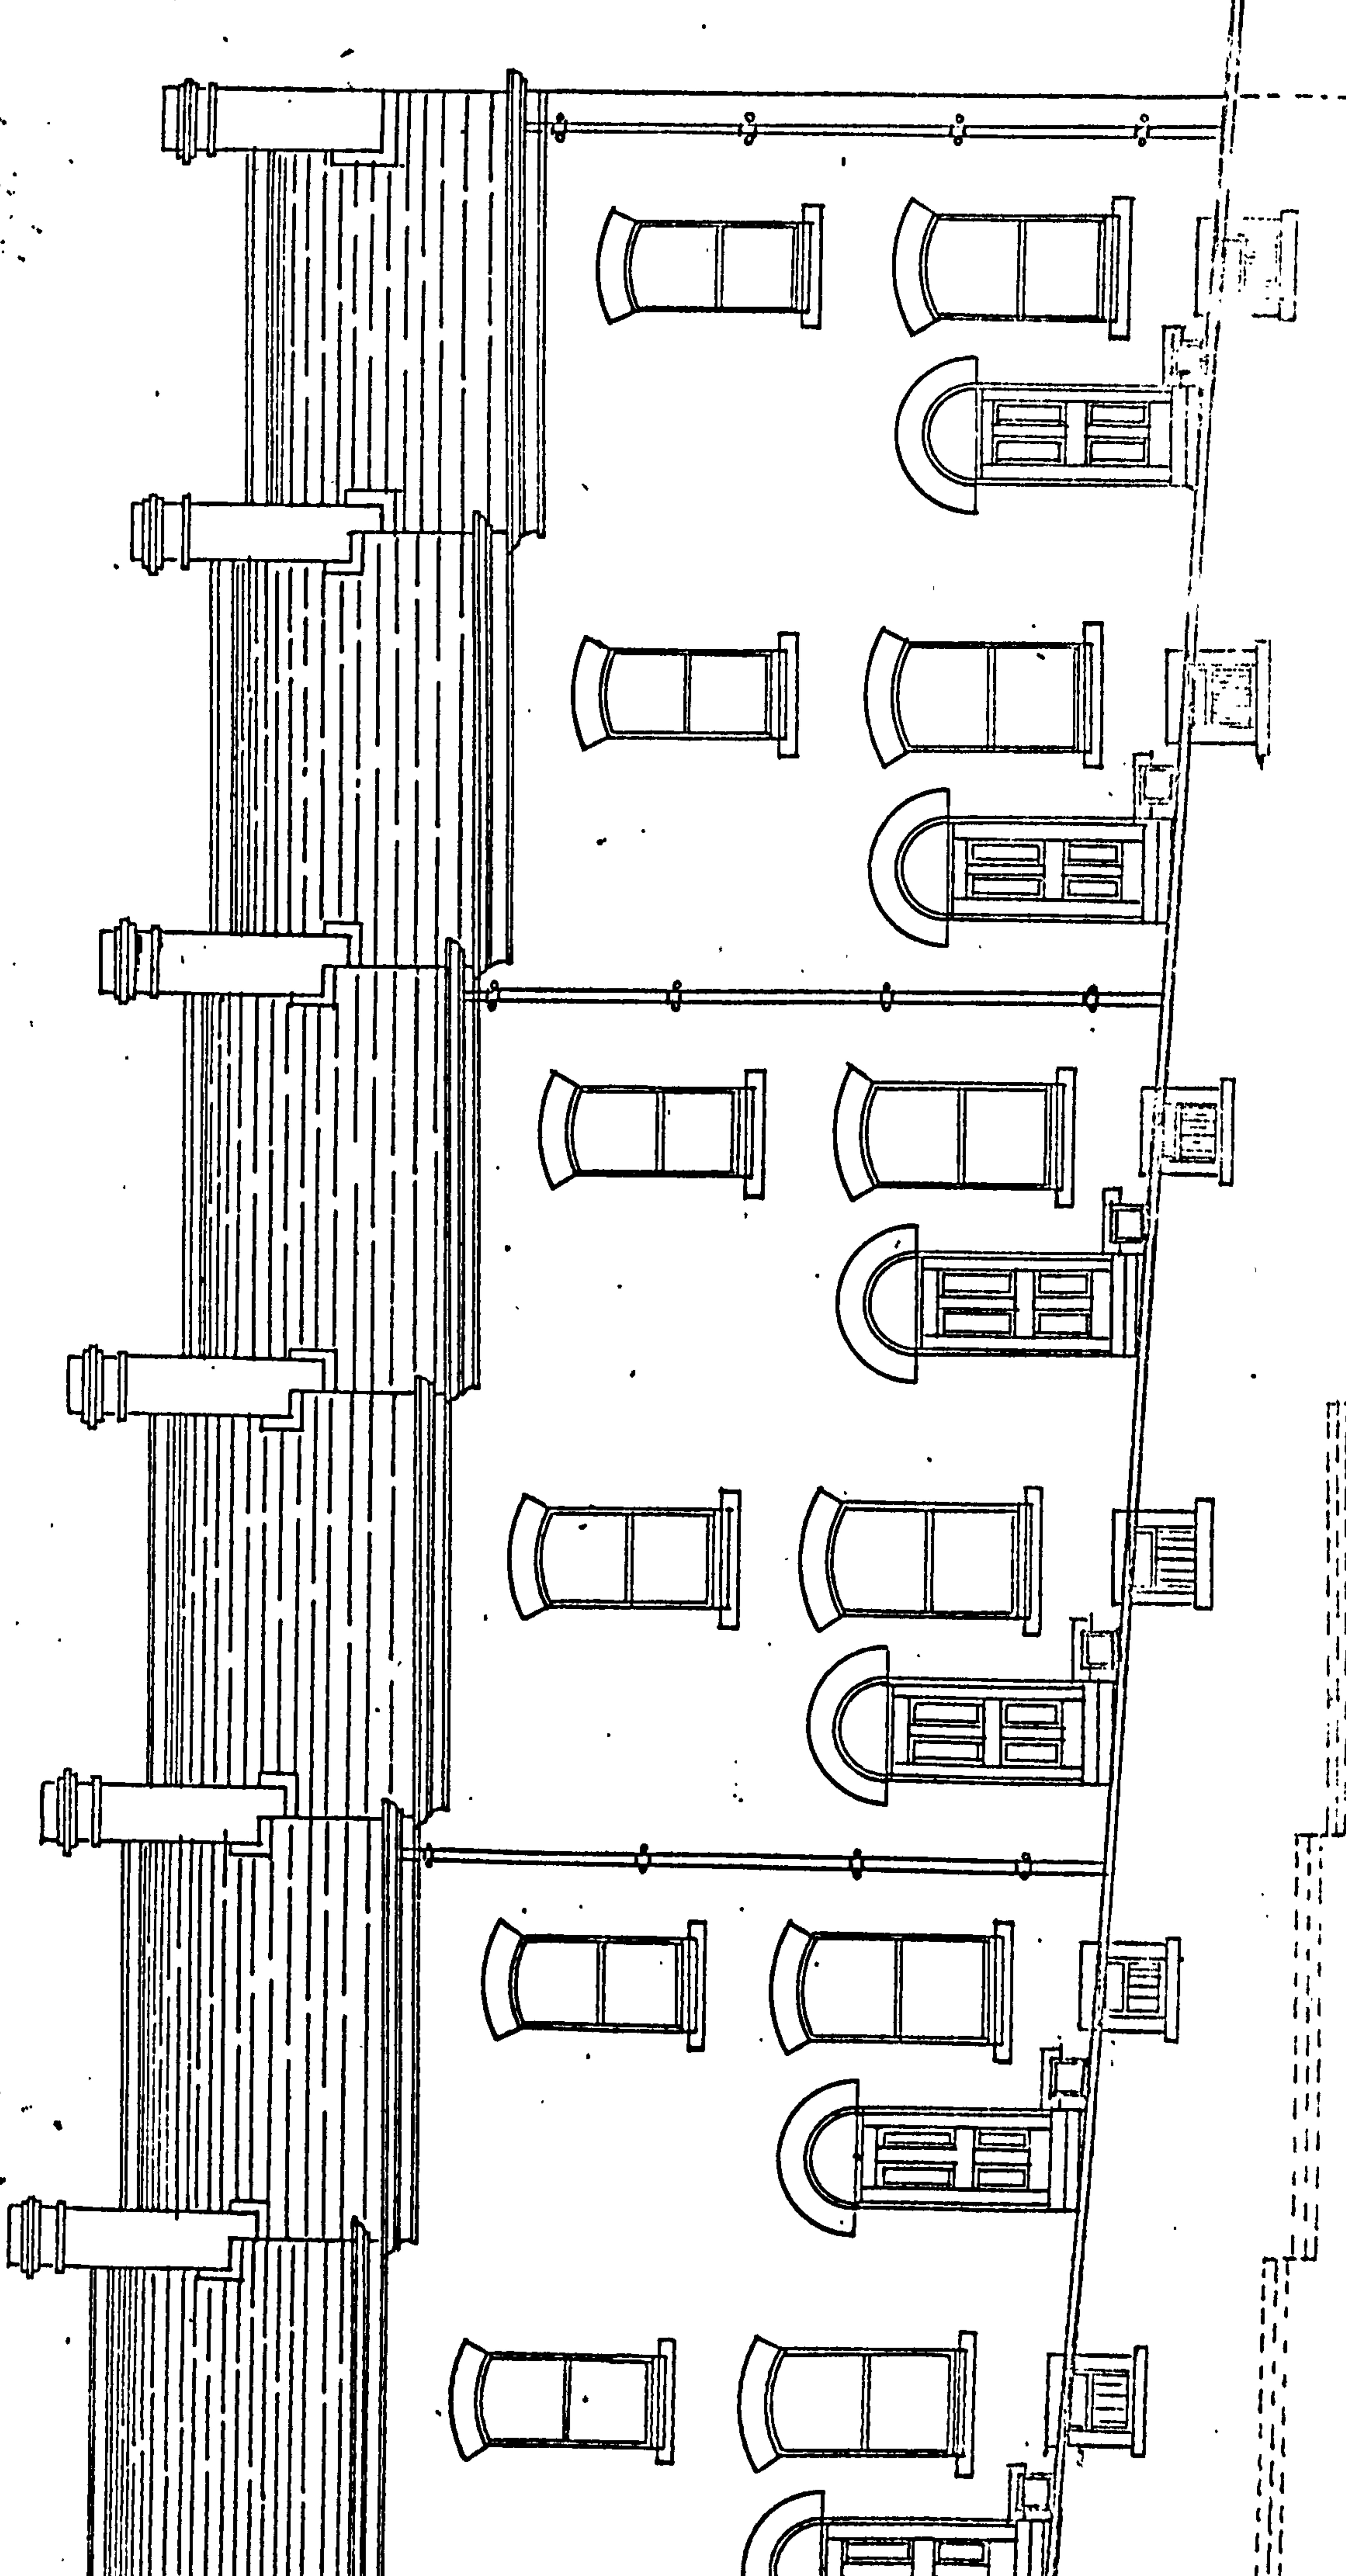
Deposited elevation of houses in Rowland Terrace, Hunslet (A. Neill 1883).
